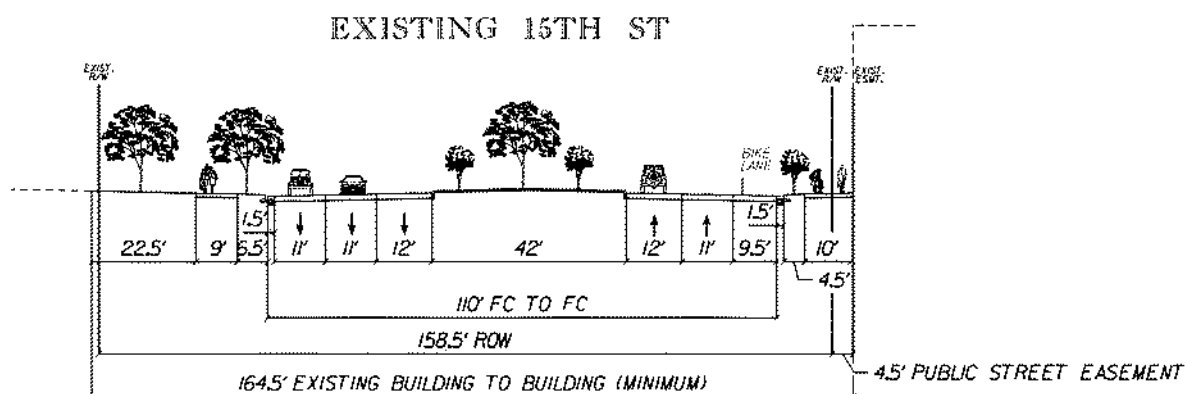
Existing 15th Street S Cross Section (looking east toward Route 1)
